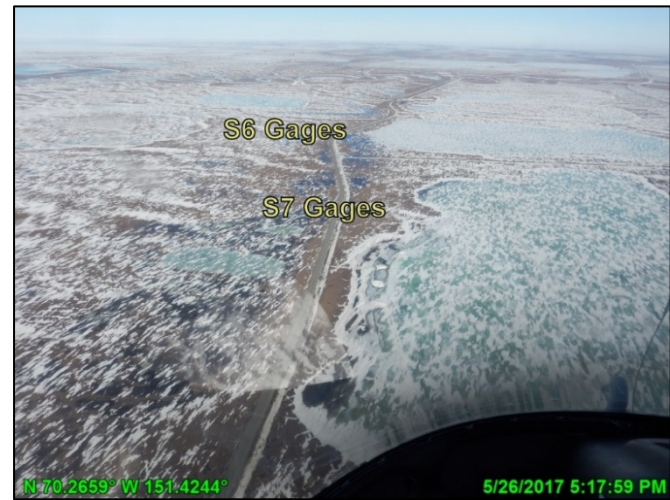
Local melt accumulating along GMT1 access road near S6 and S7 gages, looking east; May 26, 2017
